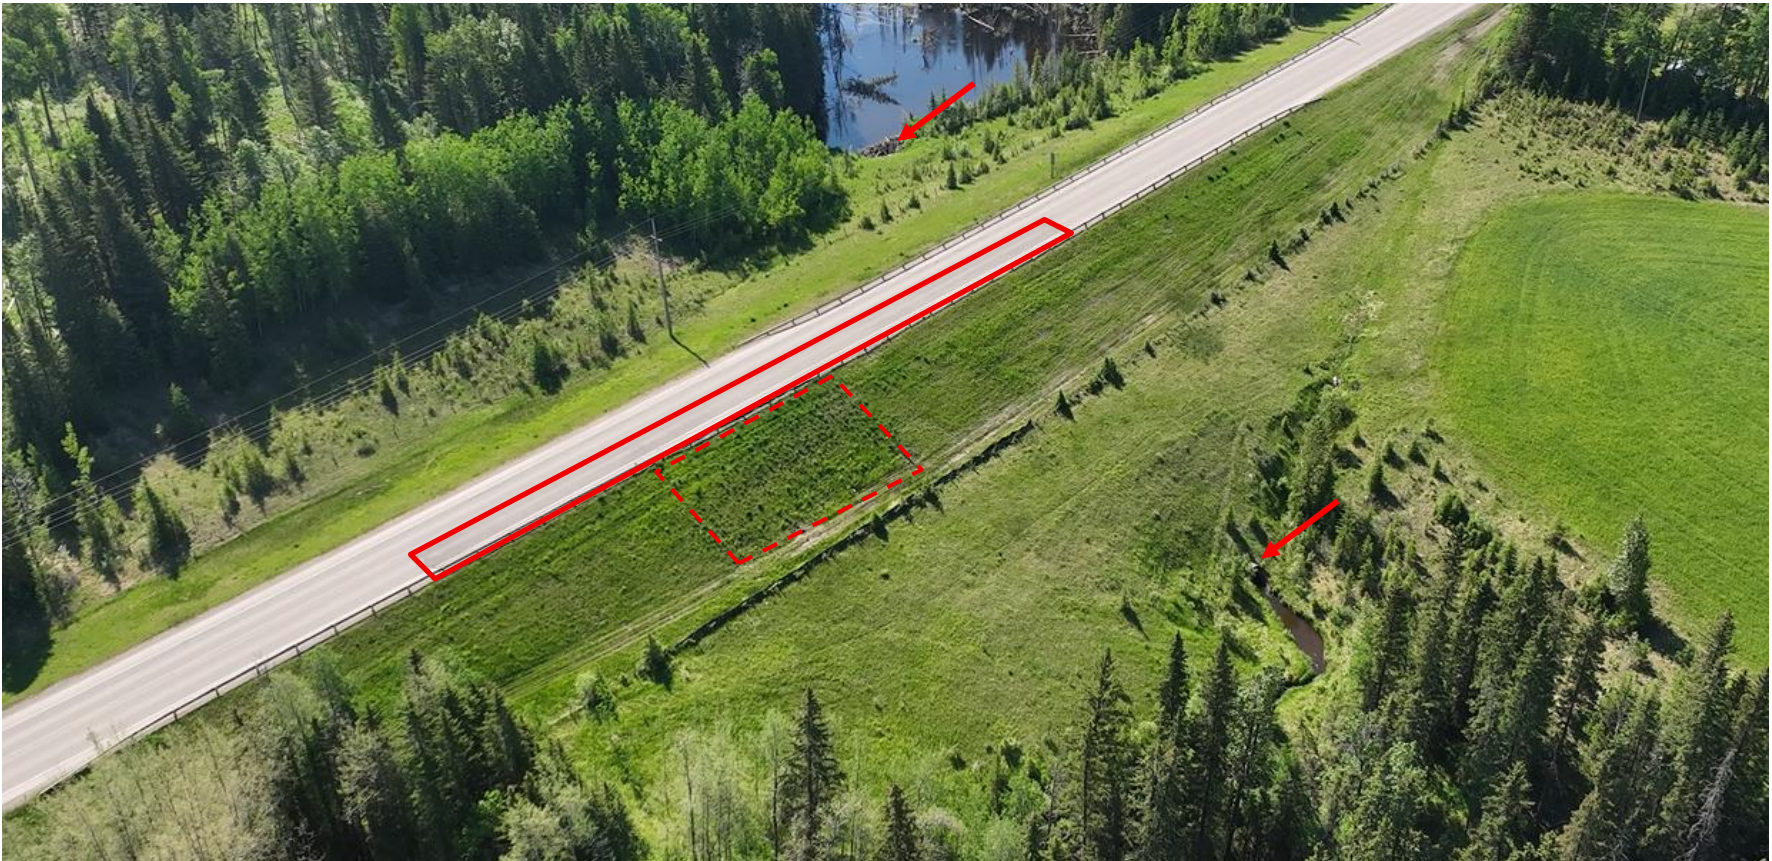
An aerial view of the C072 site, highlighting the pavement patch (red line), slide repair extents (red dashed line), and culvert (Bridge File No. 13457) inlet and outlet (indicated by red arrows). Photo taken June 9, 2025 facing north-northwest.
